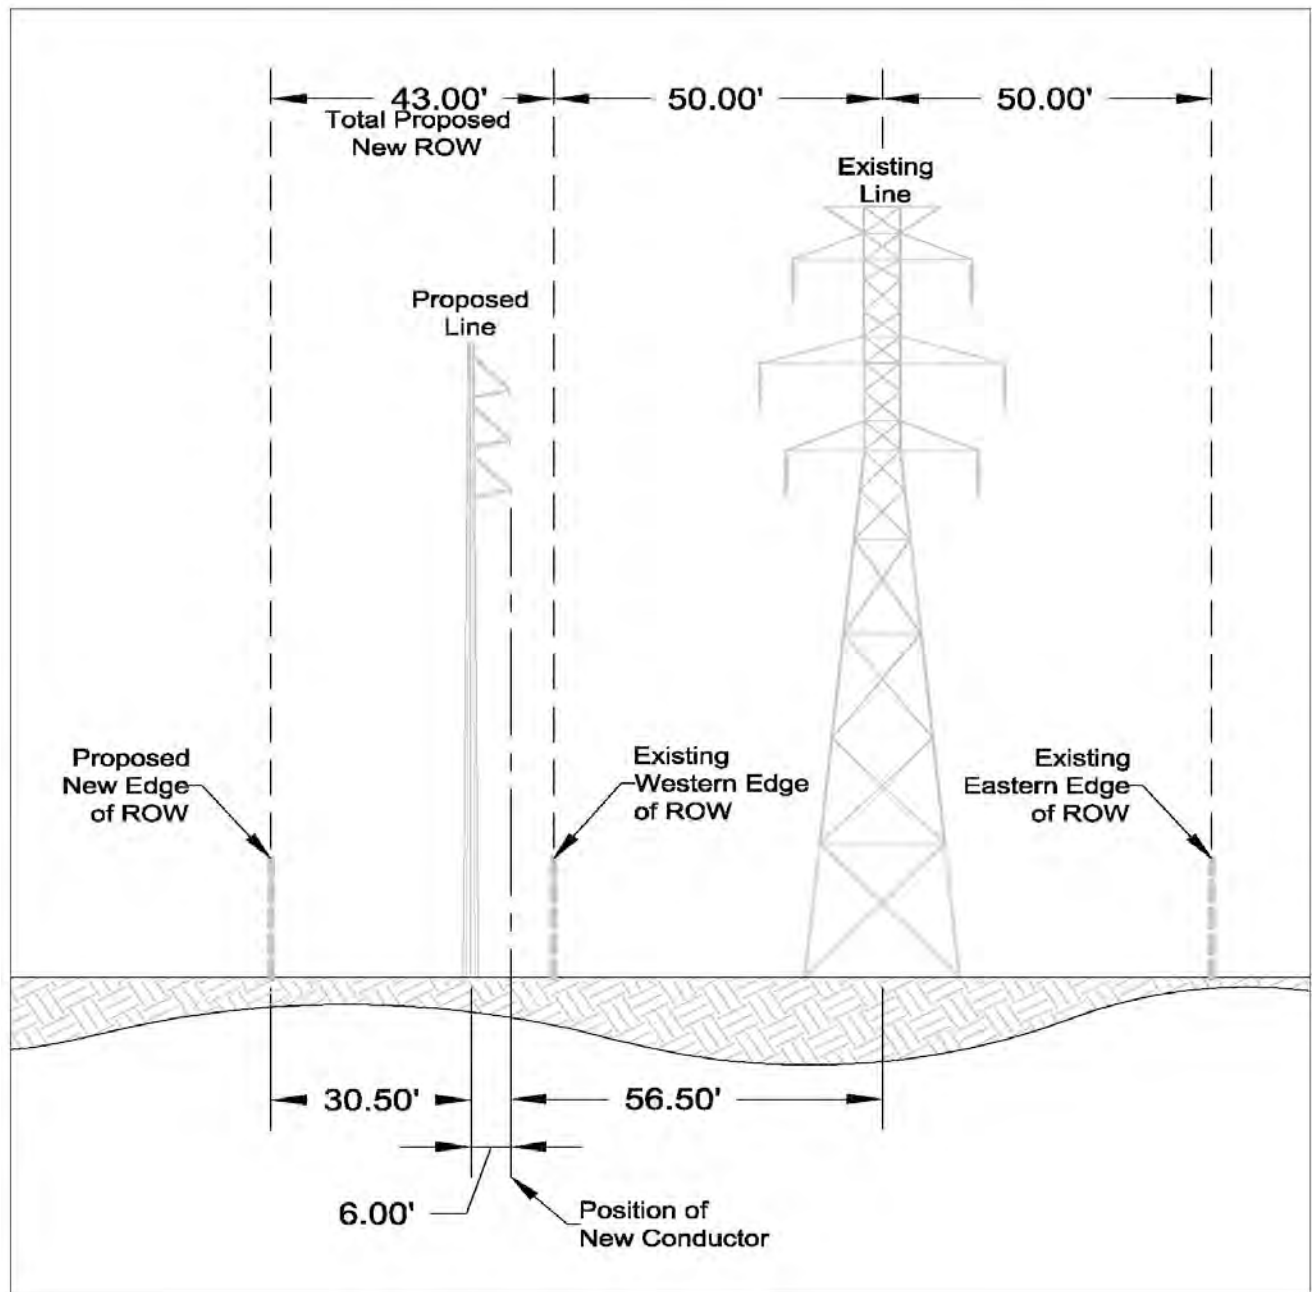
Typical Cross-Section of the Expanded Width Corridor Across the BRP Corridor
